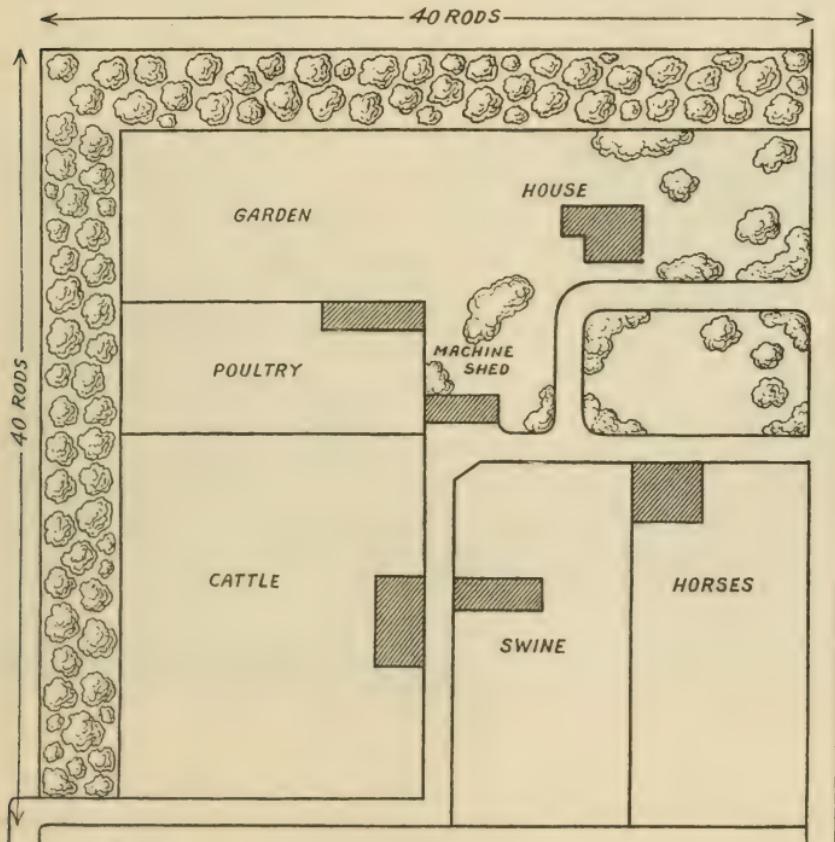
Arrangement of grounds surrounding a farmhouse.
